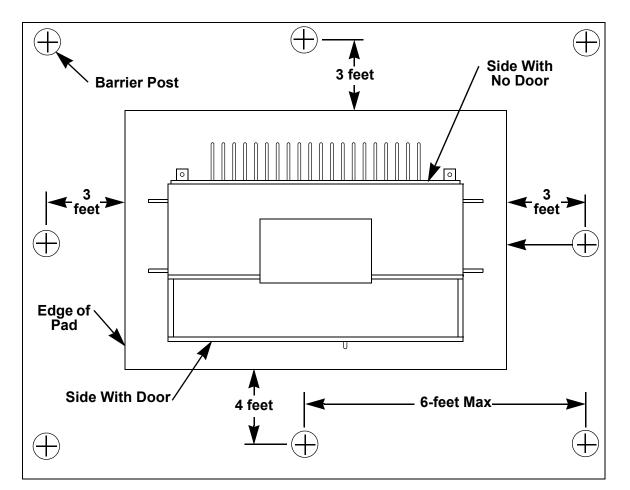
Barrier Post Locations at a Pad-Mounted Installation
